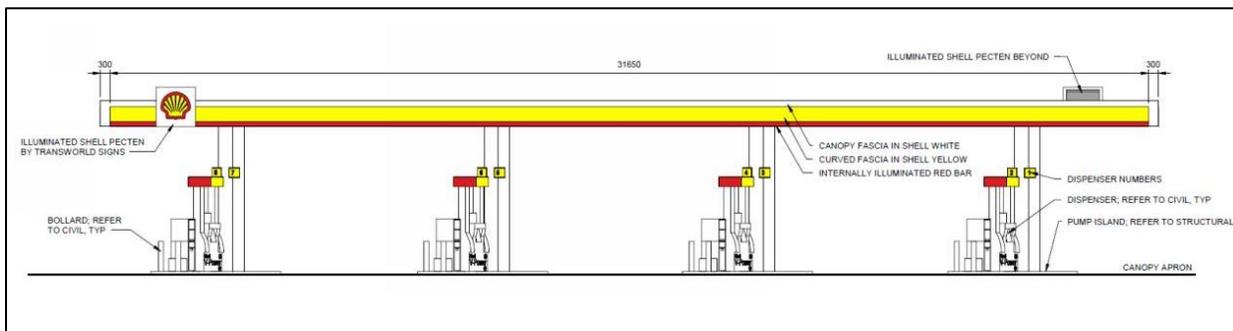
Conceptual fuel pump elevation – View looking south (shown as South Elevation on A201.2 dated November 16, 2018).
